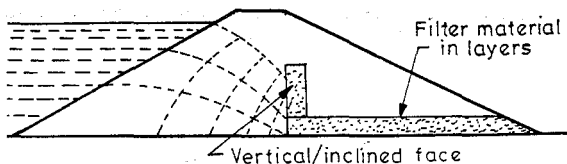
(d). 'Chimney Drain' in Stratified Embankments.
